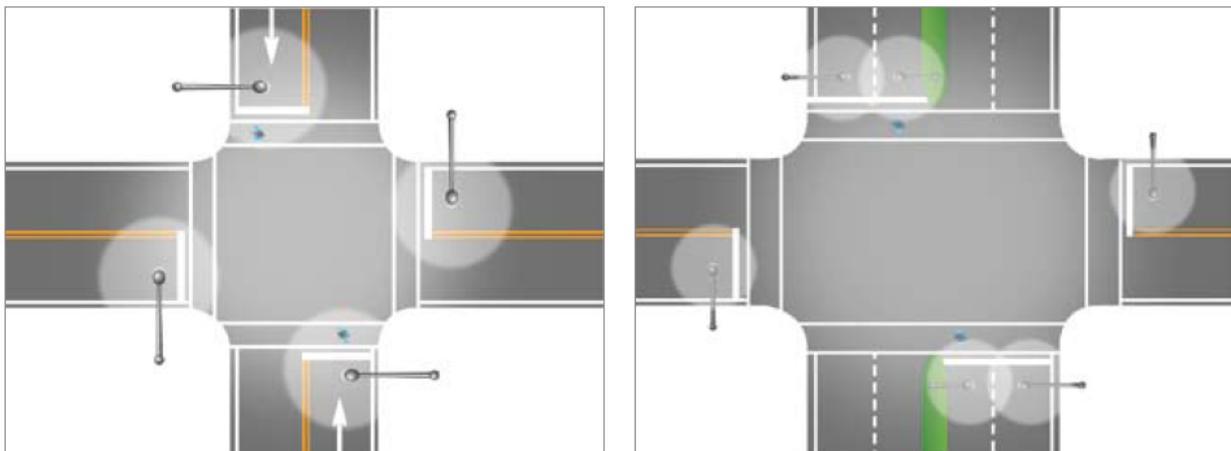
New Design for Intersection Lighting Layout (Single and Multi-Lane Approaches)⁴
